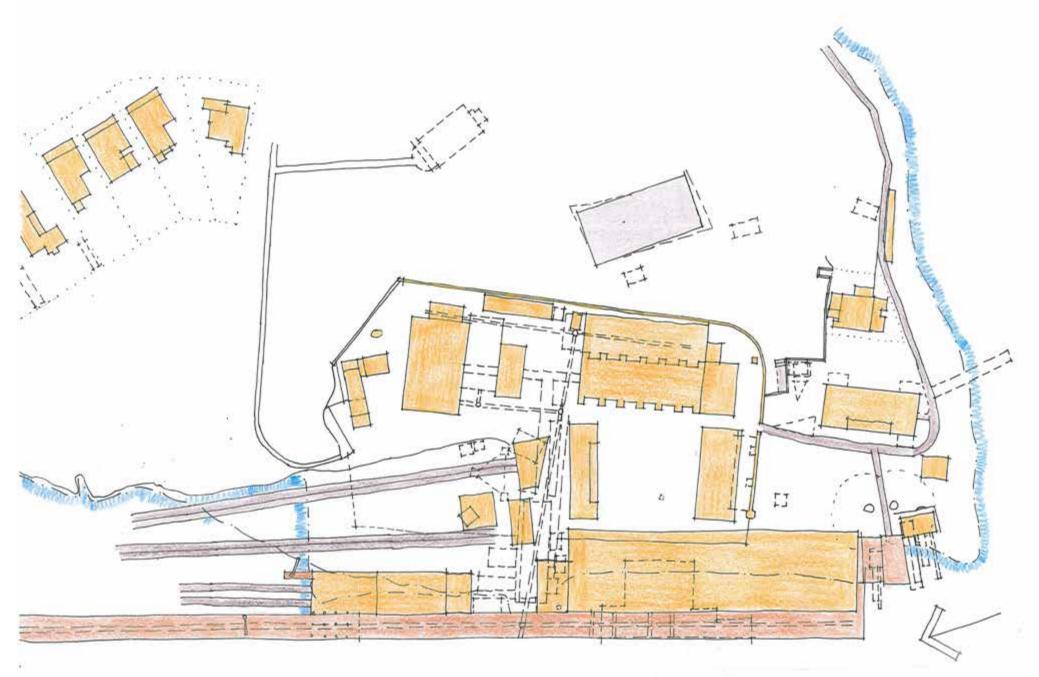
Site Plan of southern end of Goat Island: 2007
